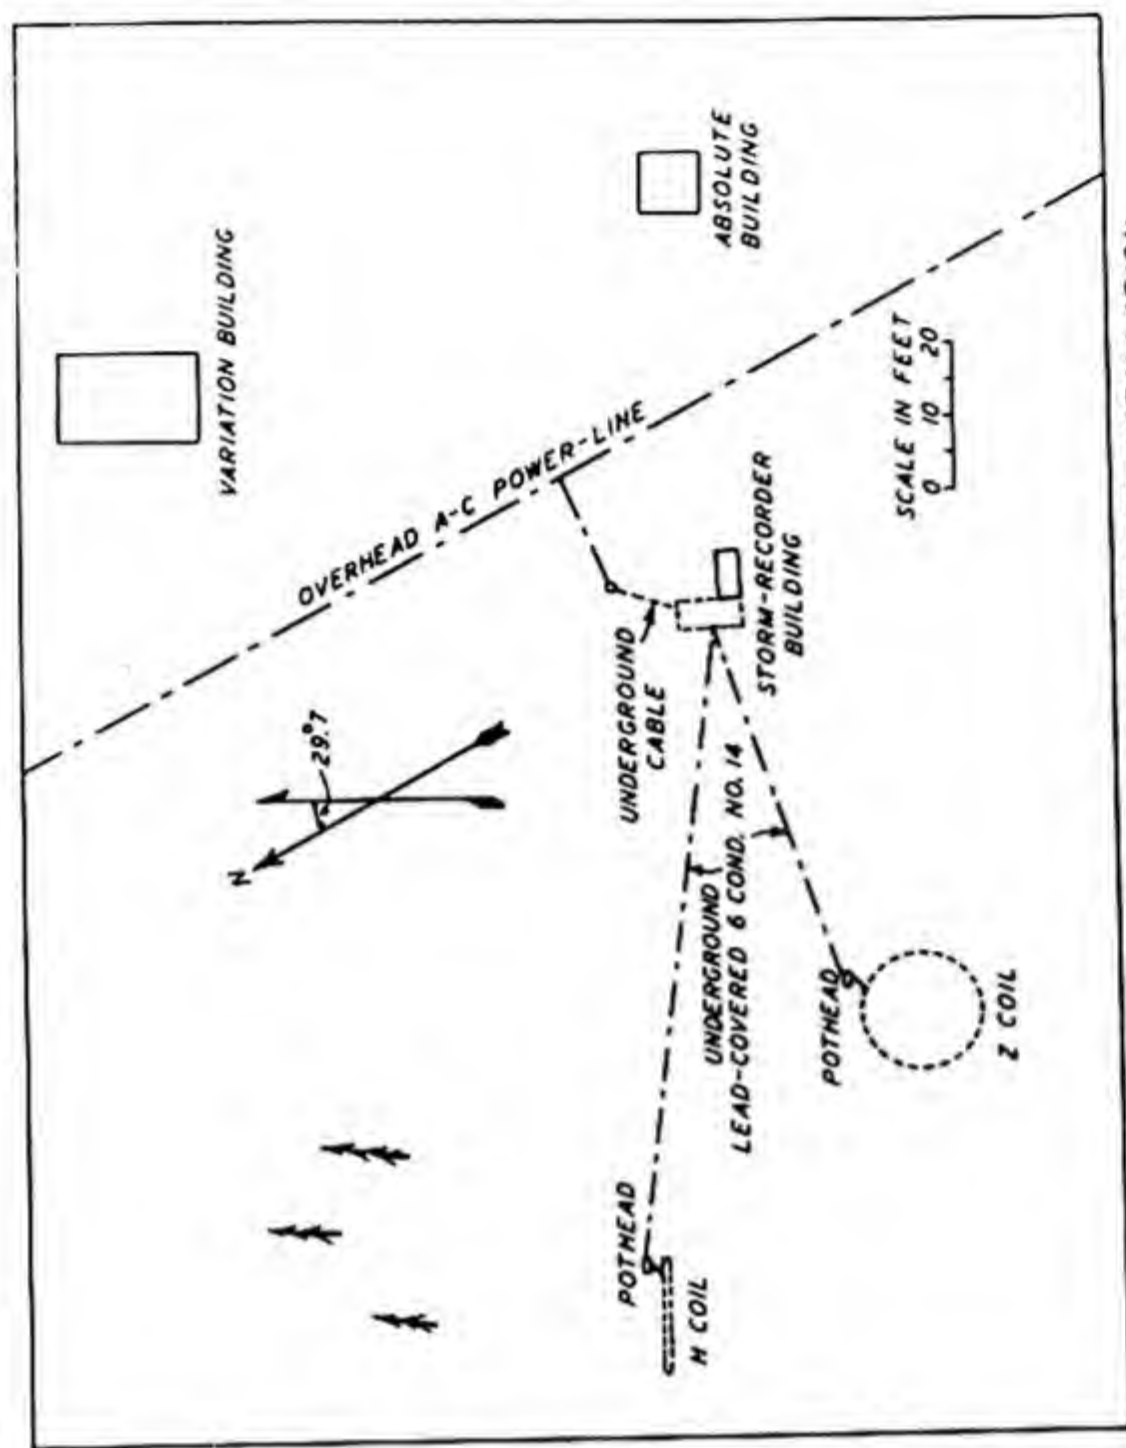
GENERAL PLAN, STORM-RECORDER INSTALLATION
